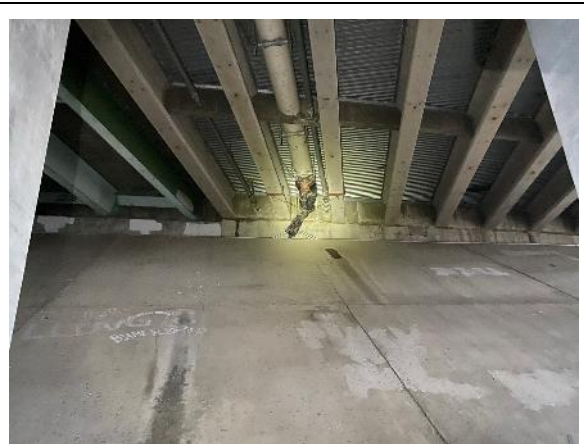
Habitat surrounding concrete girder/steel box bridge with expansion joints, utility boxes, bridge abutments (all potentially suitable bat roost habitat) consist of mowed annual grasses, industrial buildings, and potential tree roost habitat with dense clusters of leaves and crevices. (Location #25). Taken facing north.
